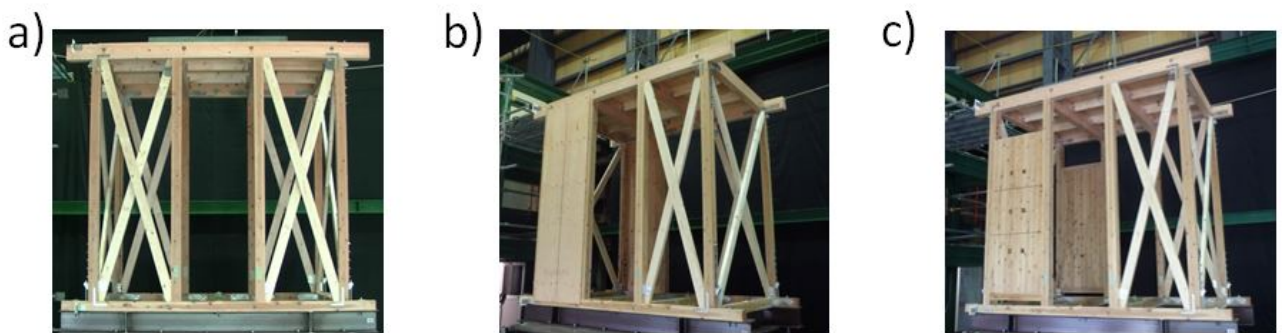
Different reinforcements applied to the woodframe. a) Braces reinforcement. b) Panels reinforcement. c) Wall of columns reinforcement
